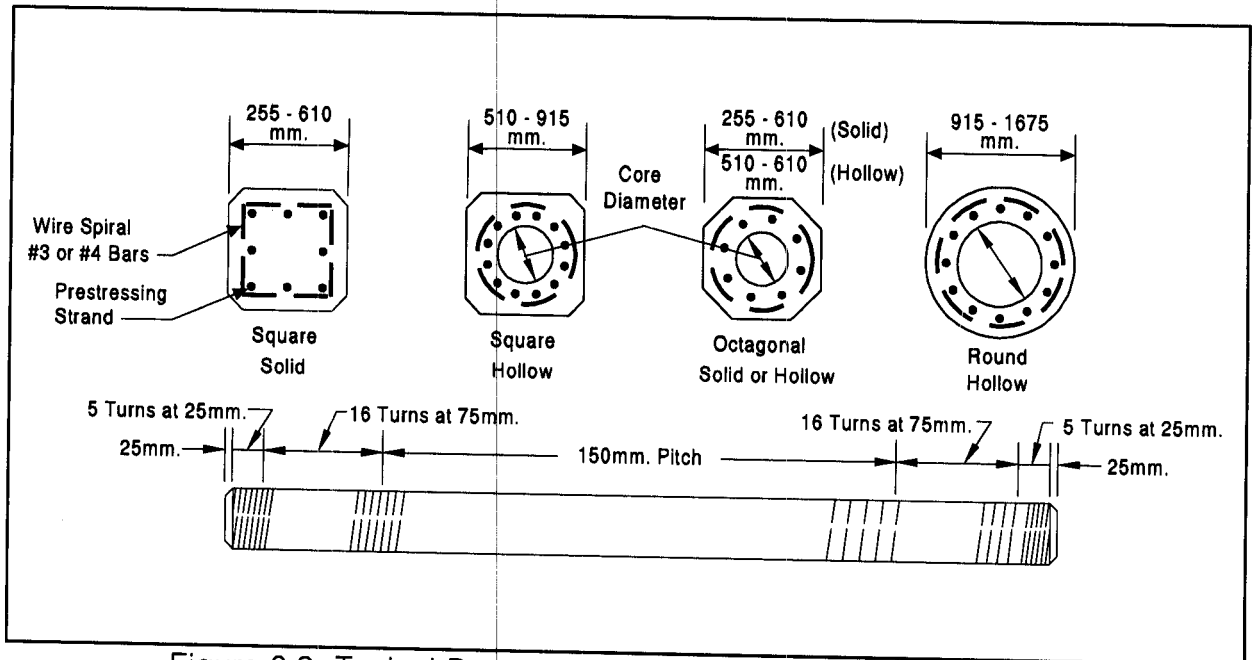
Typical Prestressed Concrete Piles (after PCI, 1993)
